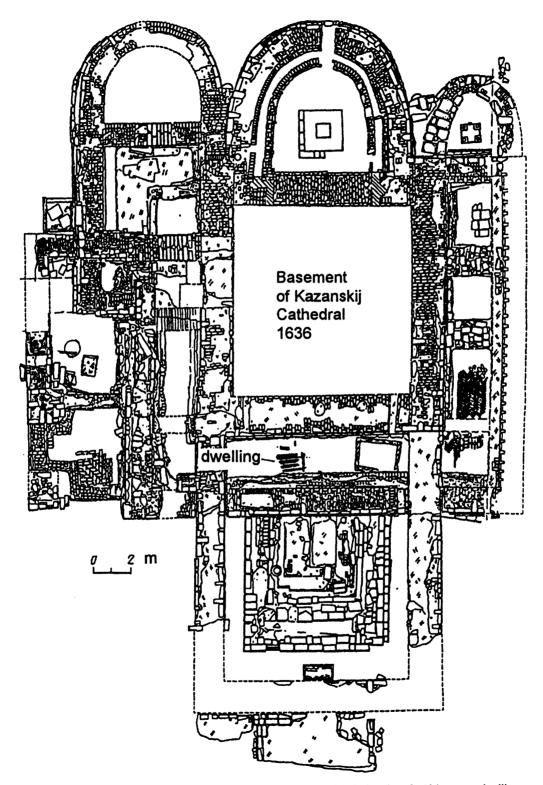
Floor plan of Kazanski Cathedral, excavated in 1989-1992, showing the location of a 13th-century dwelling
